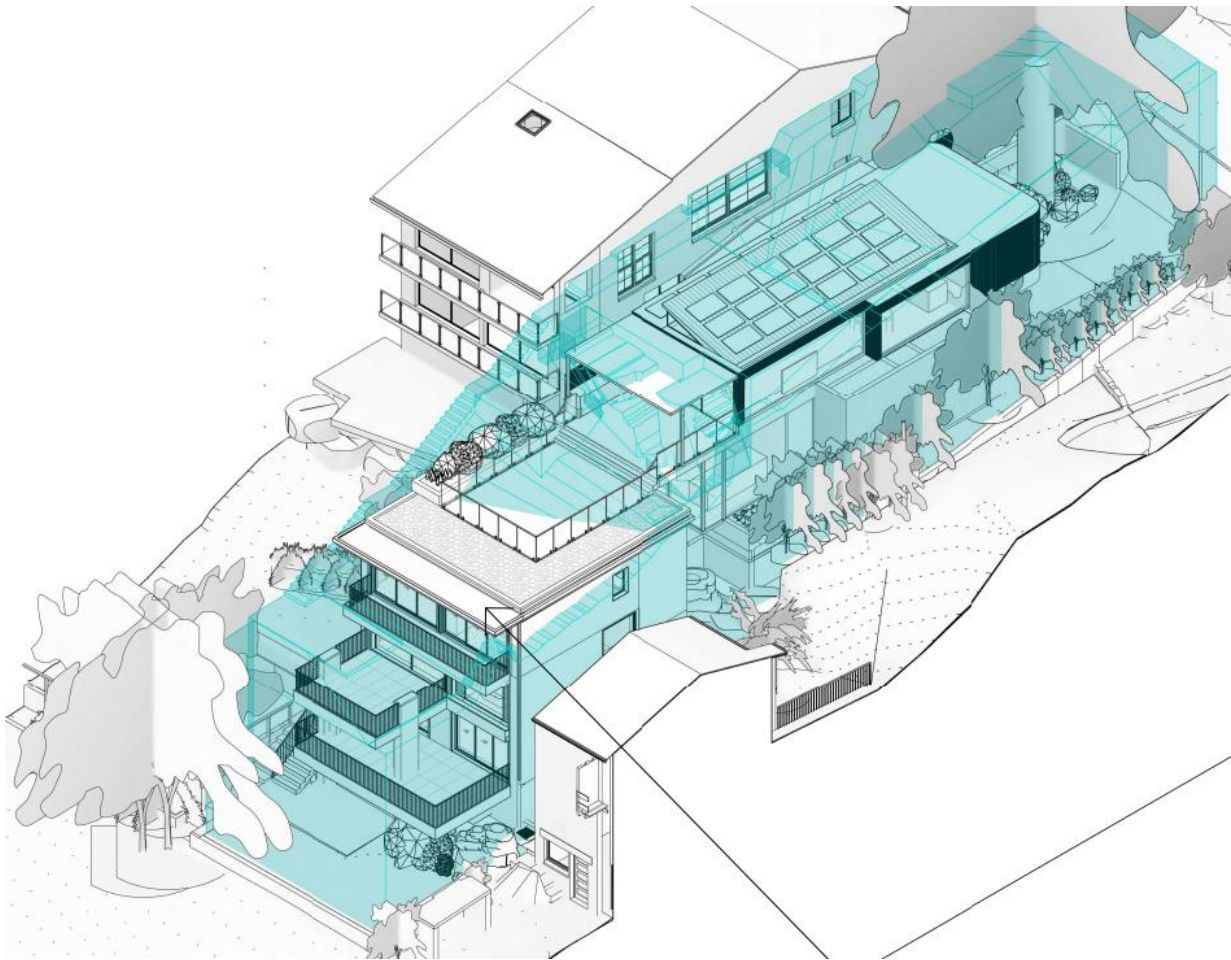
Plan extract showing 8.5 metre building height breaching elements
